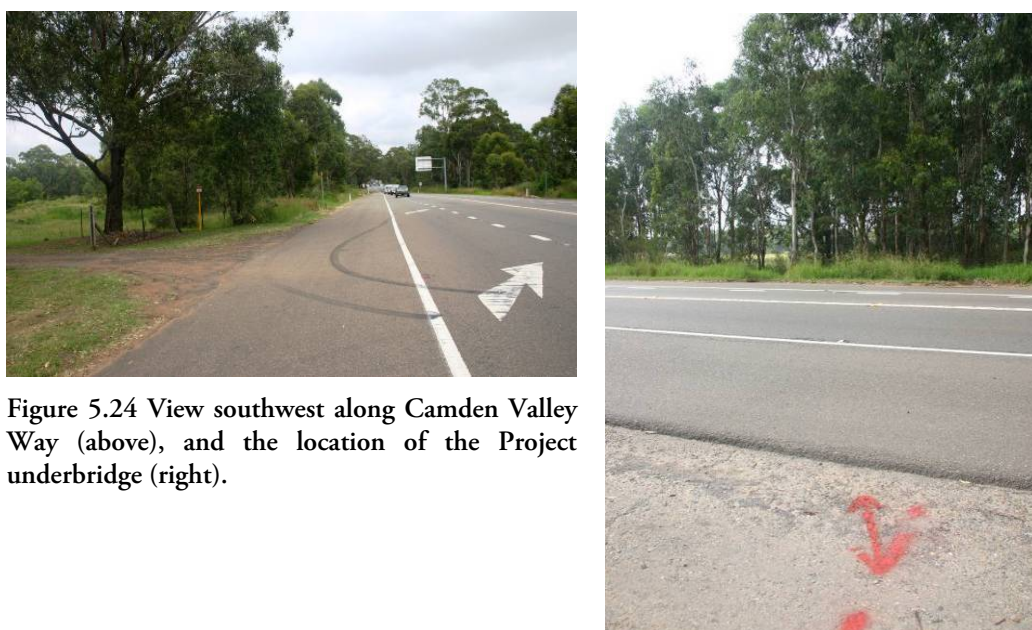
View southwest along Camden Valley Way (above), and the location of the Project underbridge (right).
